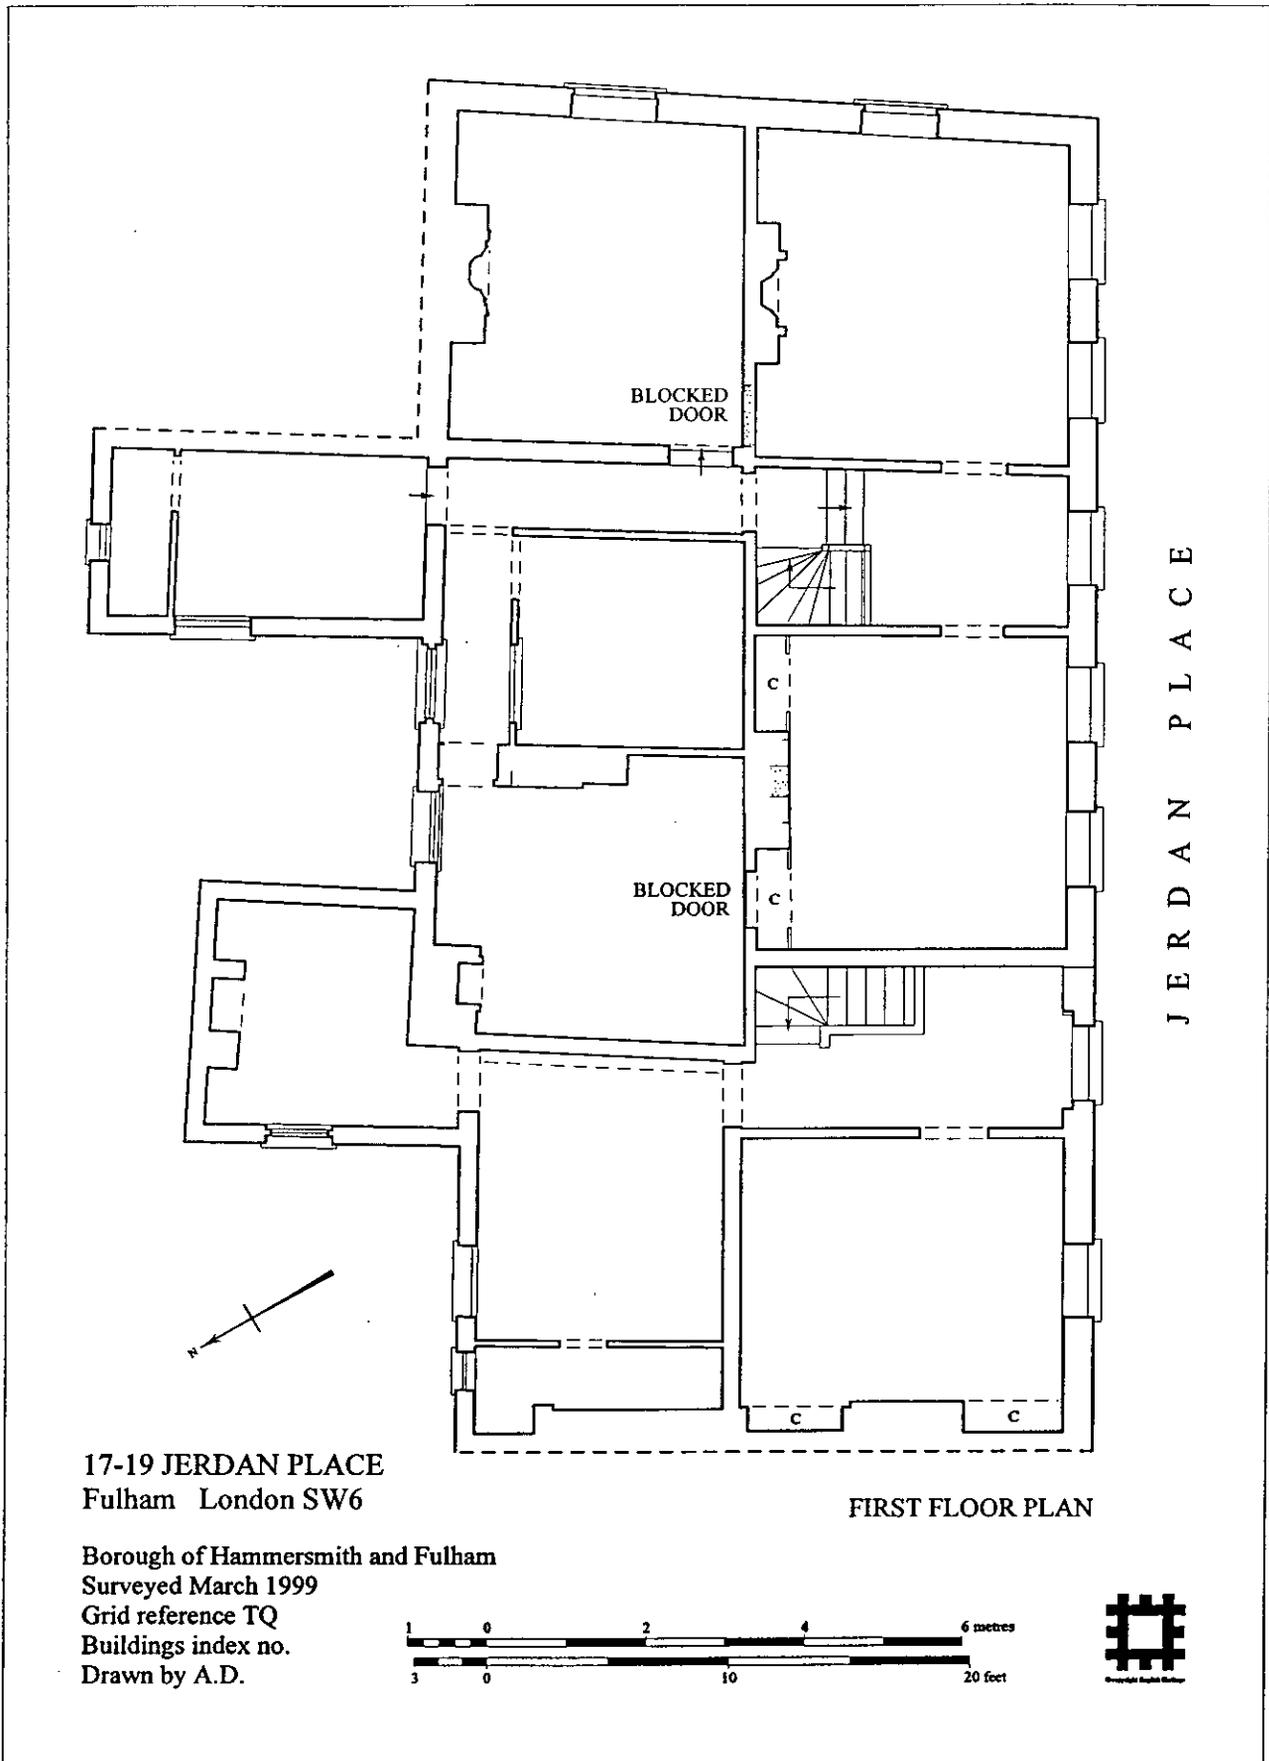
Nos. 17 and 19 Jerdan Place, first-floor plan in 1999
